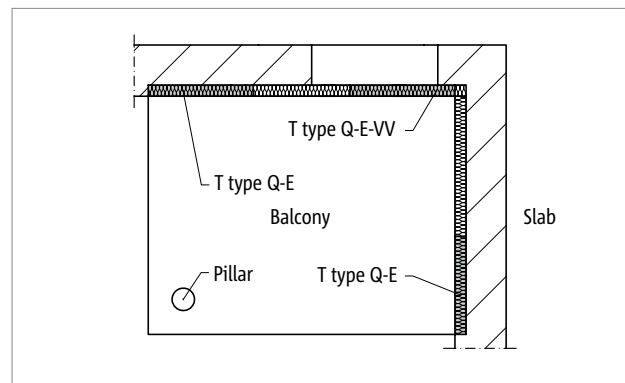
Schöck Isokorb® T type Q-E, Q-E-VV: Balcony supported on two sides with pillar and positive shear forces
